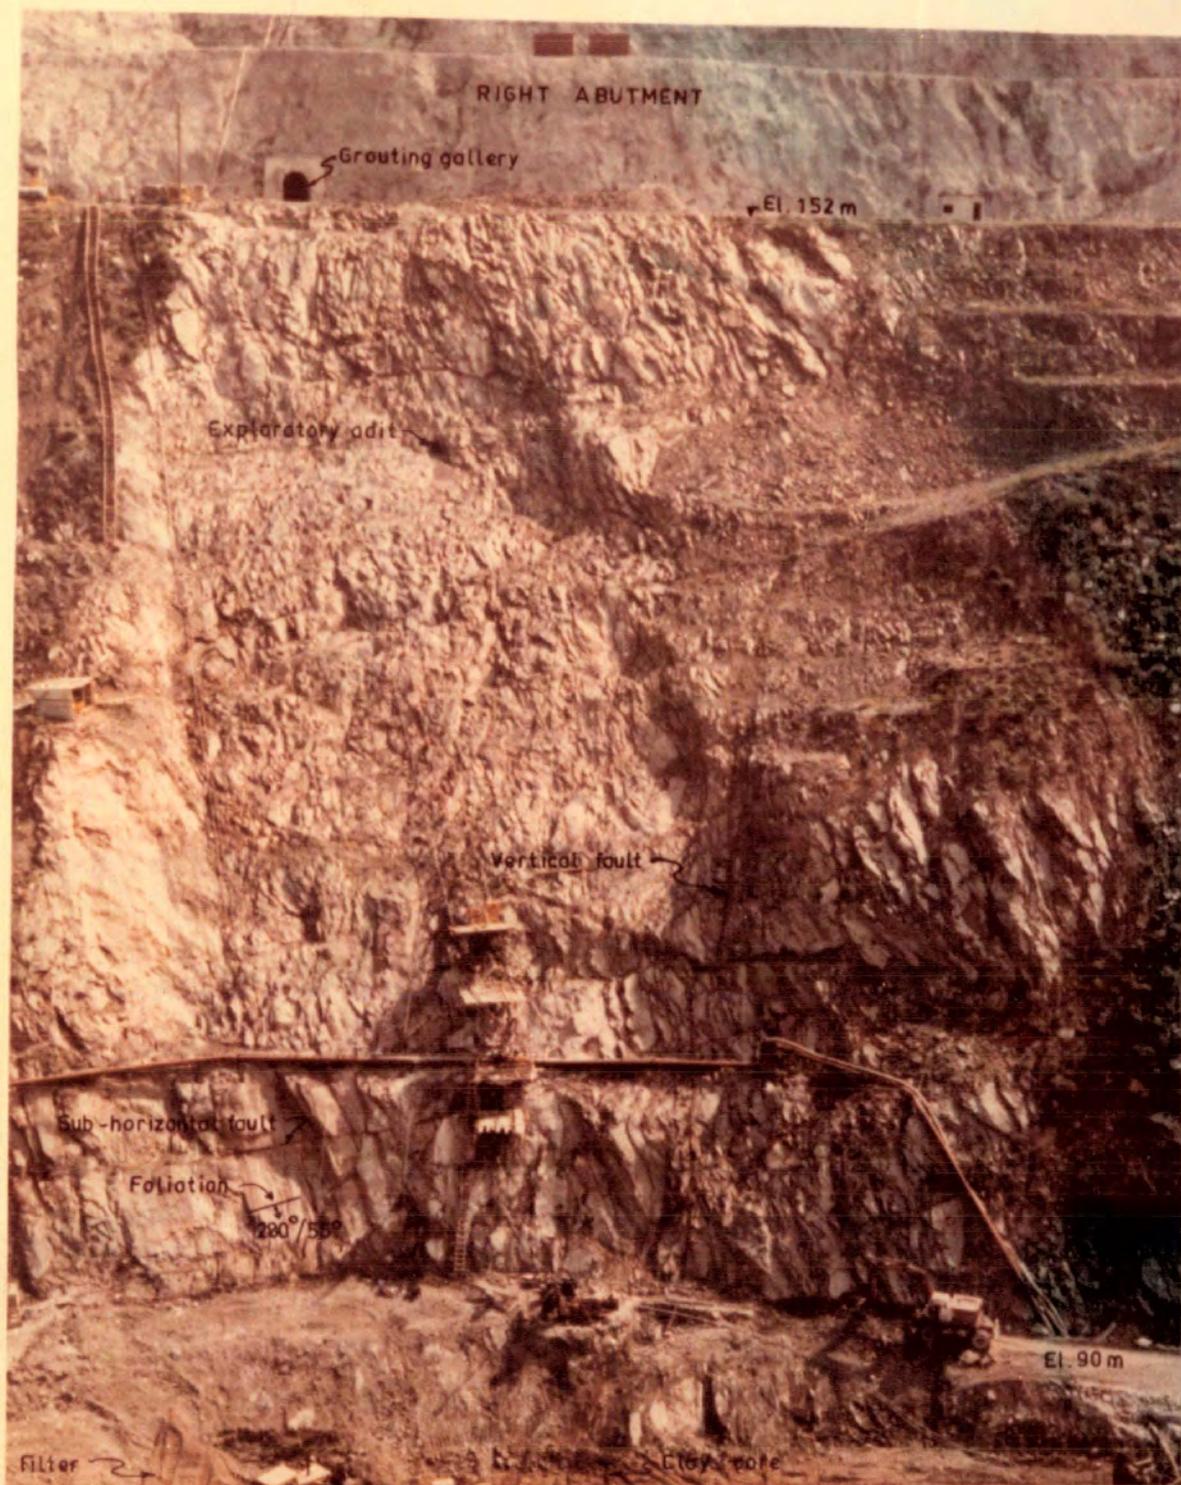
Core trench clearing, and grouting in progress. Right abutment at Sfikia dam.
